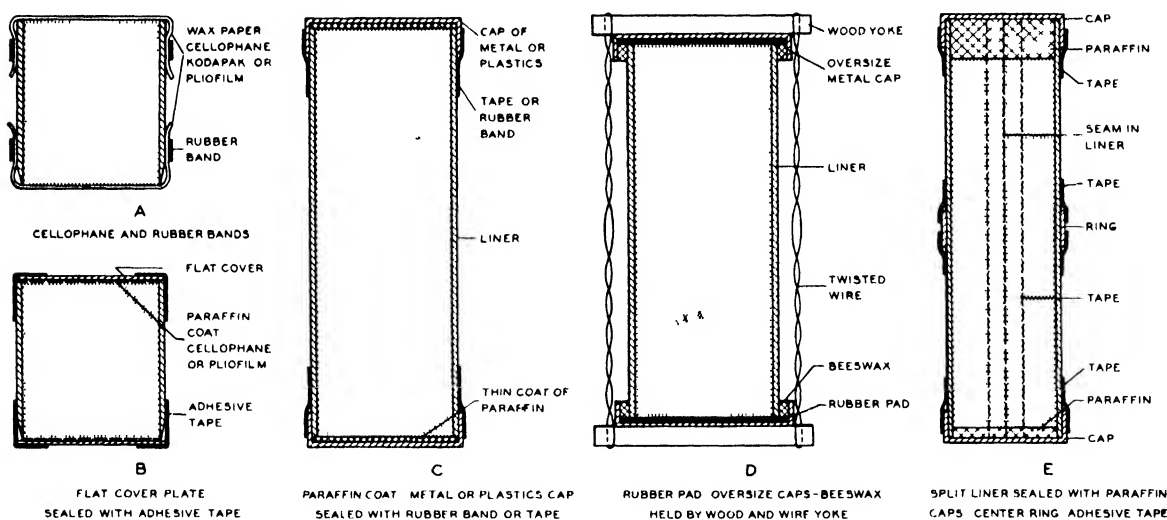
SEALING OF SHORT TUBES AND LINERS
